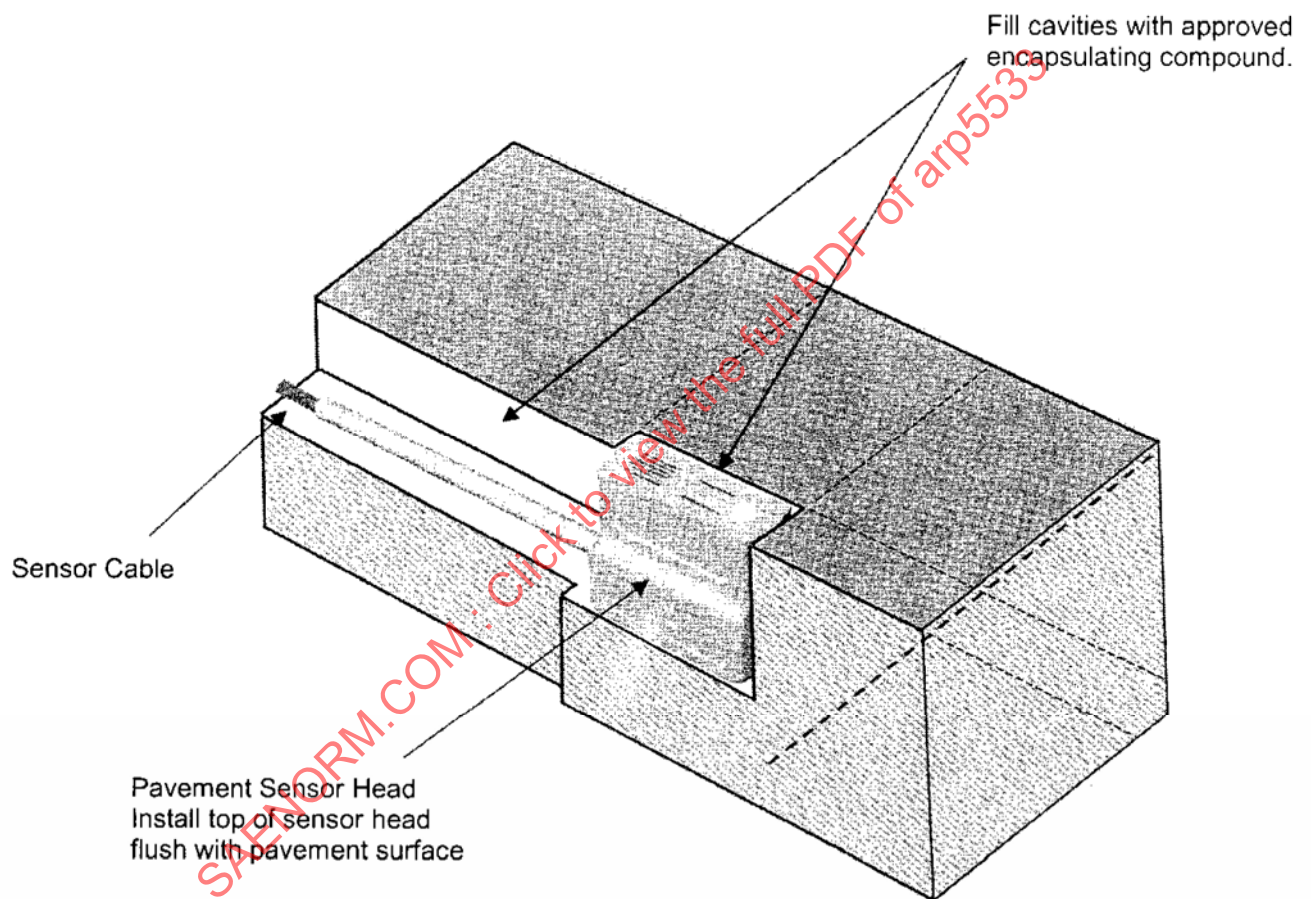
Alternate Typical Sensor Installation Cuts
